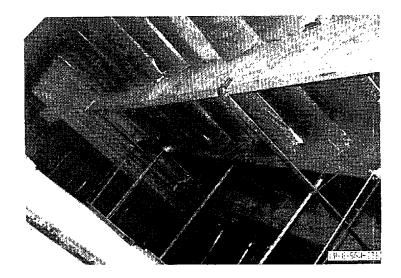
At a disk drive assembly plant, located in the epicentral area of the 1989 Loma Prieta Earthquake, seven sprinkler heads on flexible rodhung pipe broke due to impact with adjacent wood ceiling beams.
